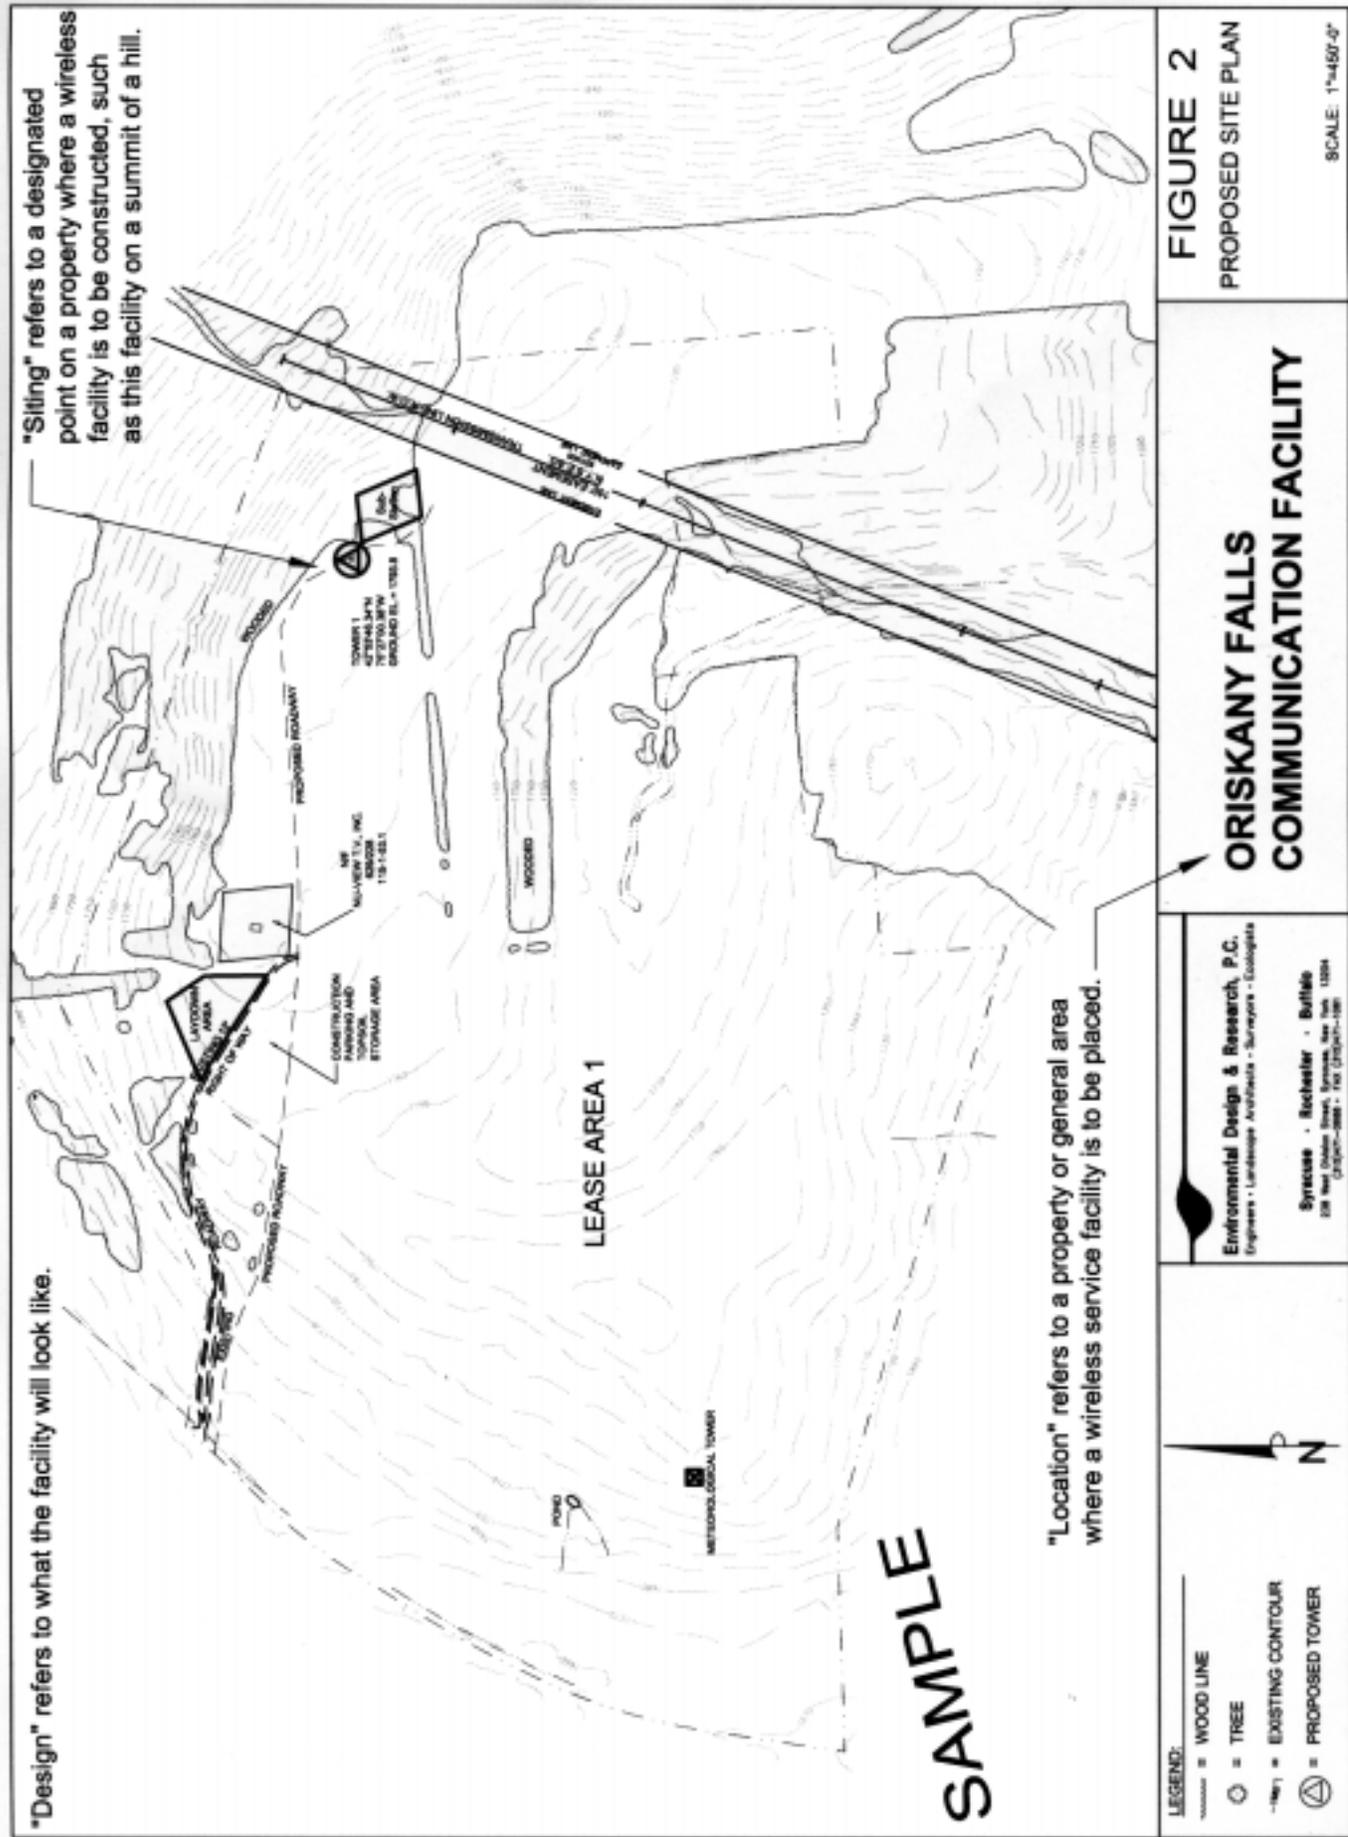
Proposed Site Plan—Oriskany Falls Communication Facility
